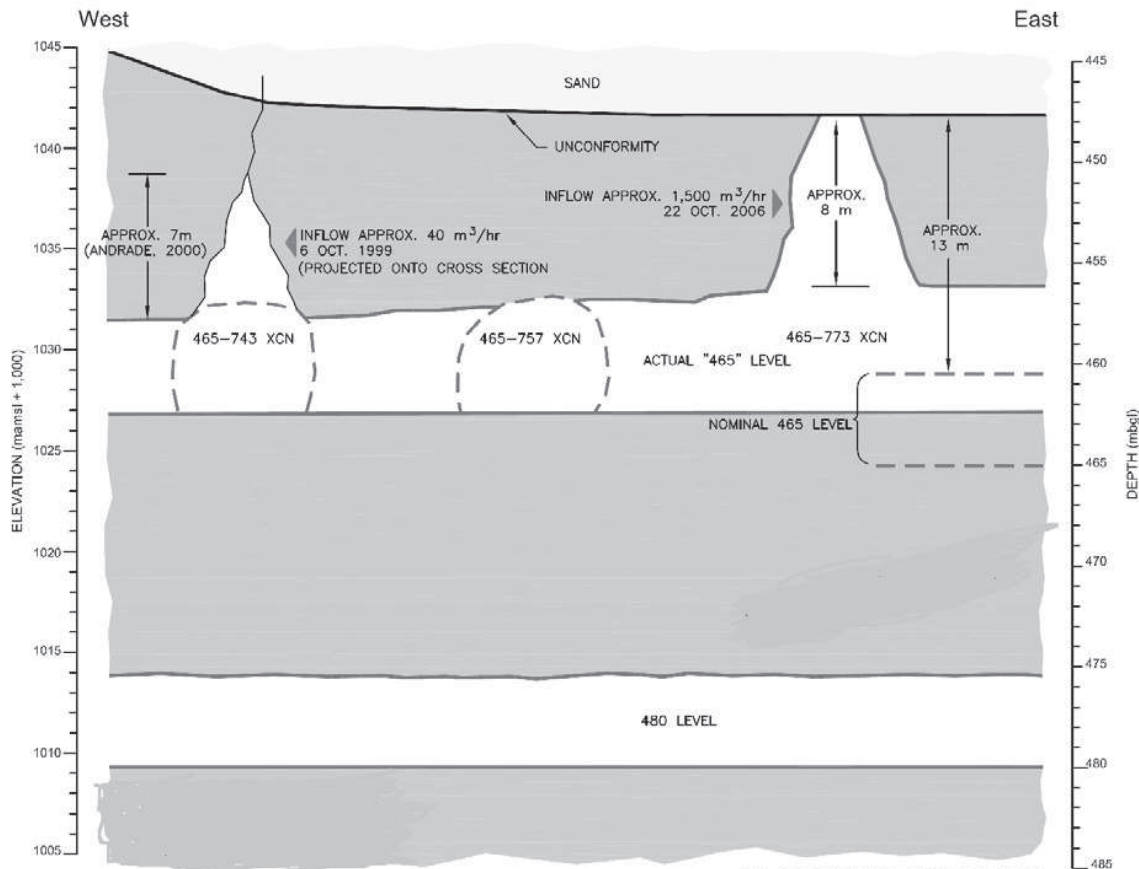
cross-section of roof failures at 465-743 XCN and 465-944 DRE
